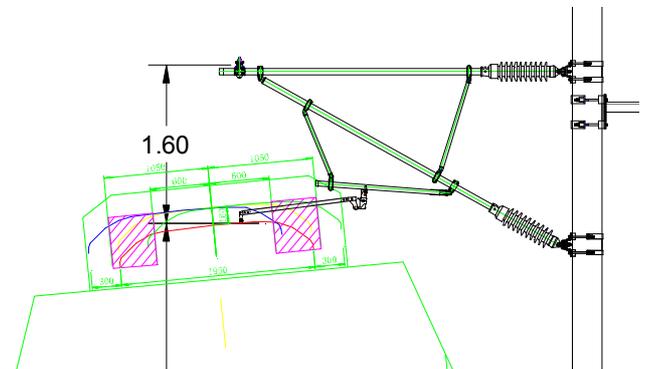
Typical installation diagram of overhead contact system under 150 mm outer rail superelevation -- curved outer reverse positioning.
